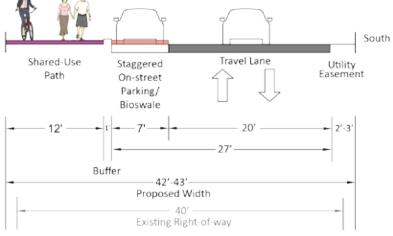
Proposed cross-section for Monroe Street, between Linwood Avenue and Maplehurst Road
